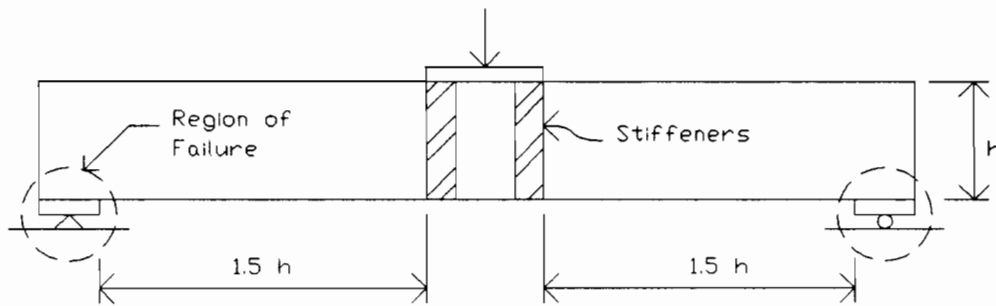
Cross Section View of a Floor Deck Specimen.
